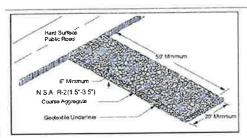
Crushed Stone Construction Exit Installation Requirements
